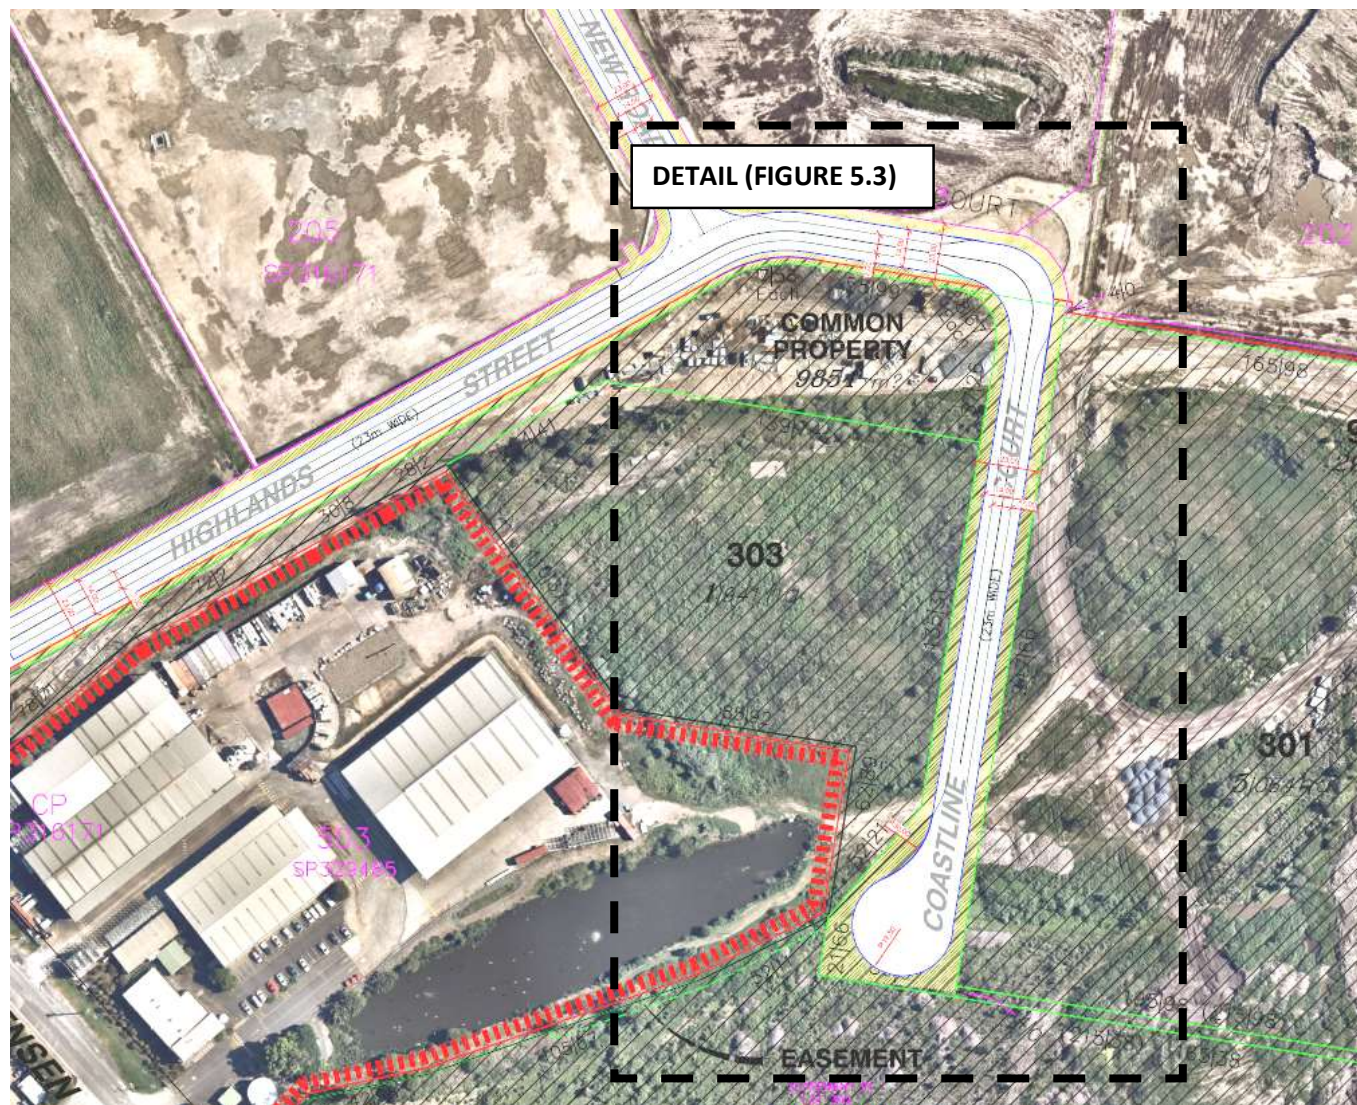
INTERNAL ROAD LAYOUT (OVERALL PLAN)
